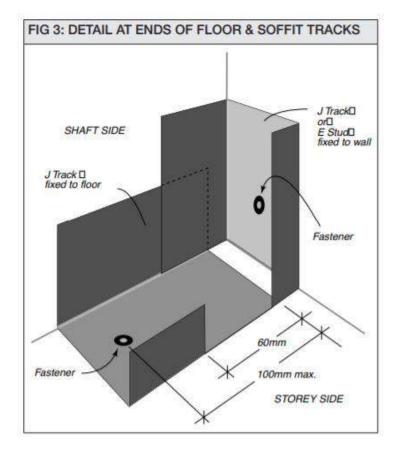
Detail at ends of floor and soffit tracks, CSR Shaft Systems
